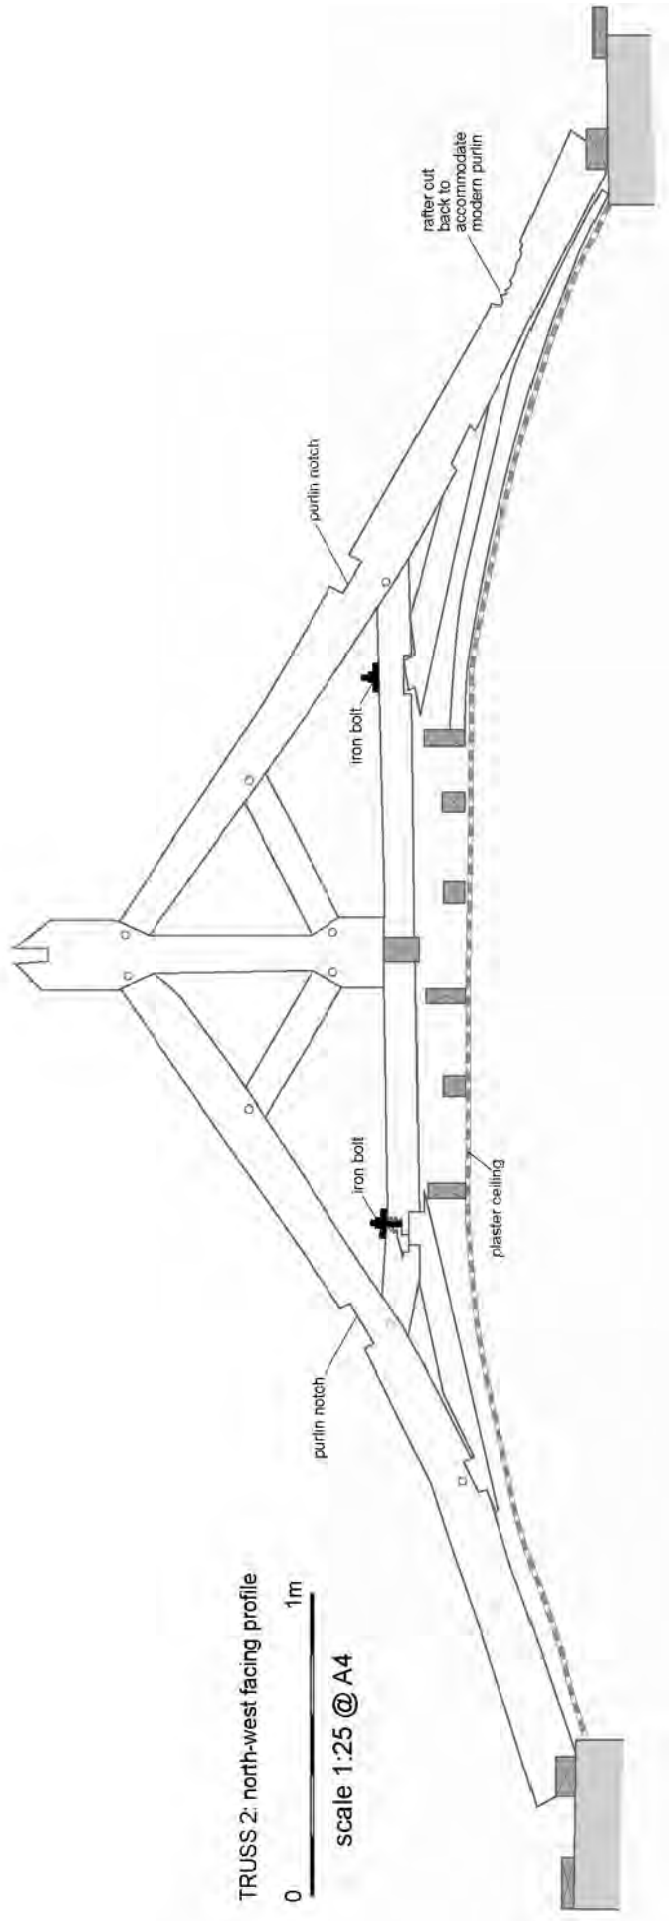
The recorded truss and ceiling profile at Fishleigh House.
